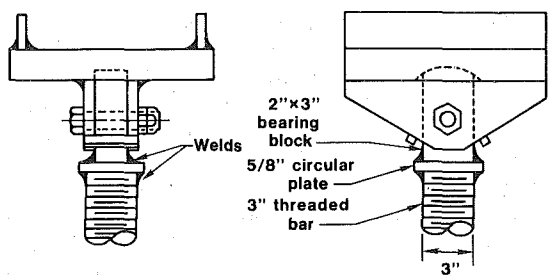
Front and Side Views of U-Heads Used to Support Crossbeams at Top of Shoring Towers
